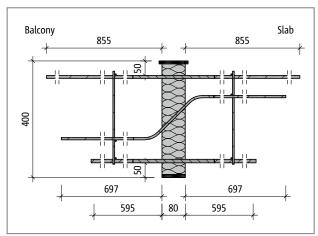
Schöck Isokorb® T type B-M1: Product section
